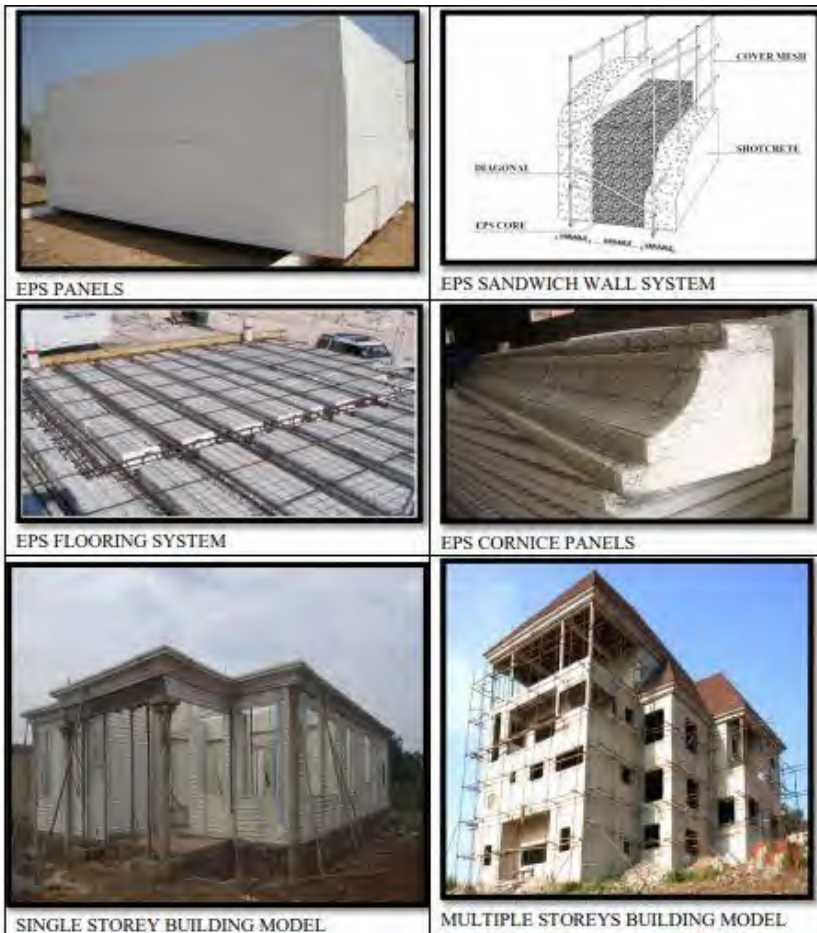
A typical example of EPS building systems. Source: CITEC International Estate Abuja
